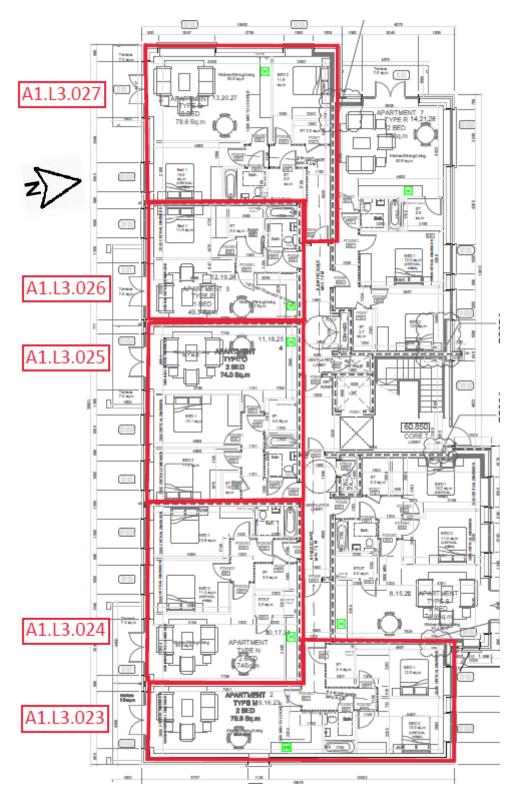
Floor Layout of the Existing Block A1 (Pappan Grove) – Third Floor
